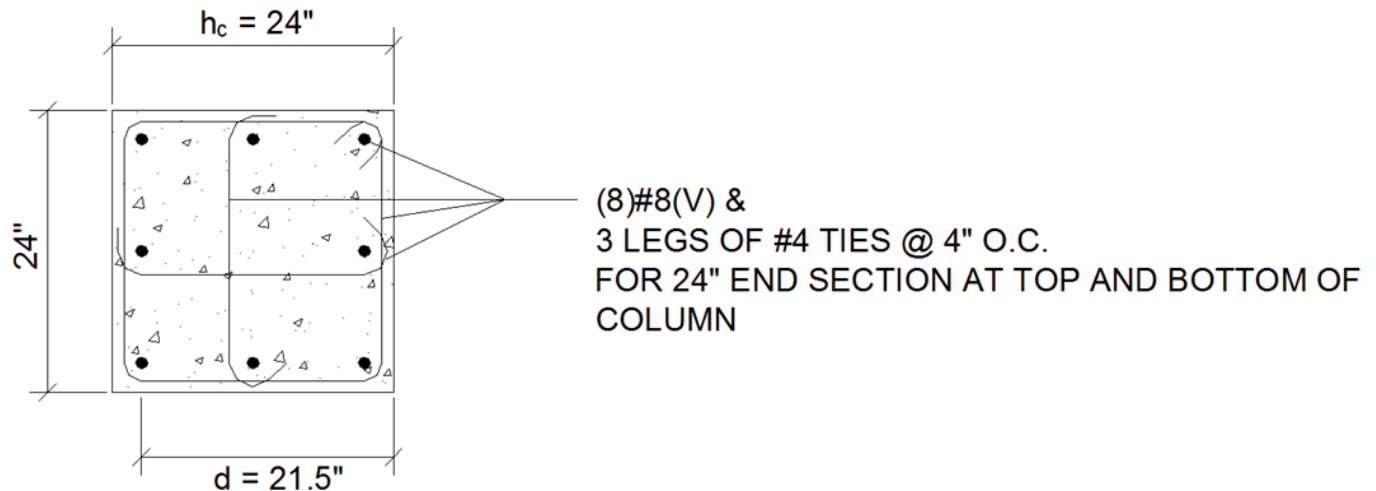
Interior column, end section cross-section for column at all floor levels based on SDC D design.
